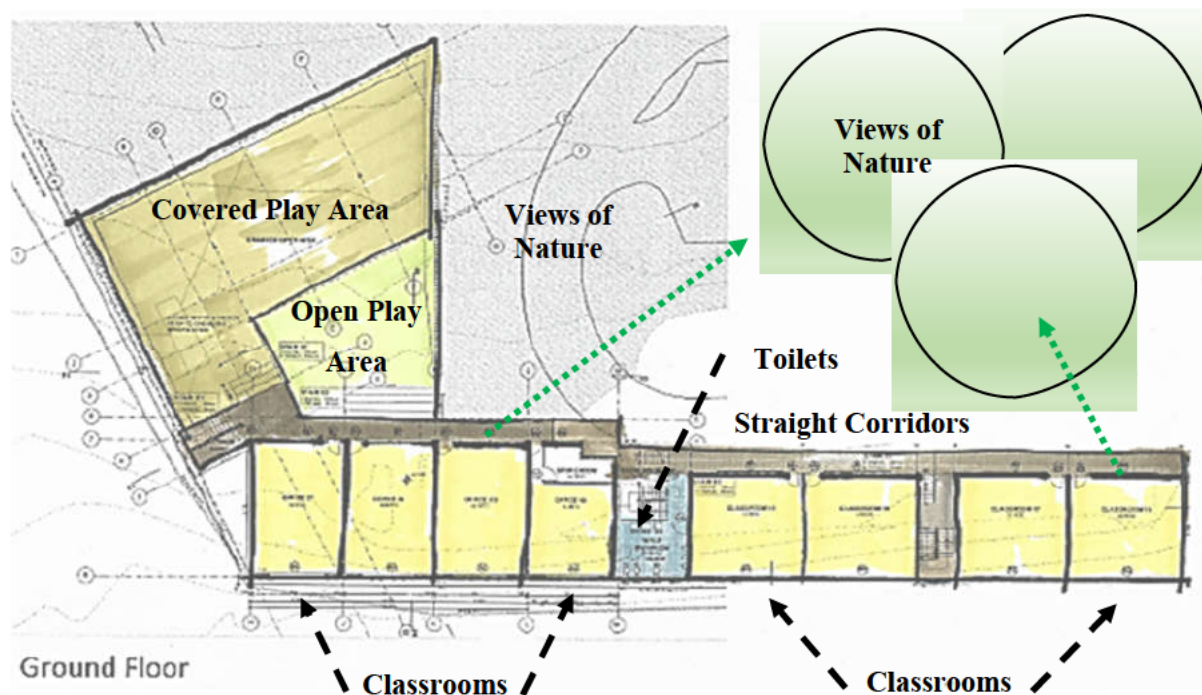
Ground Floor Plan Layout (Source: Author 2023)
